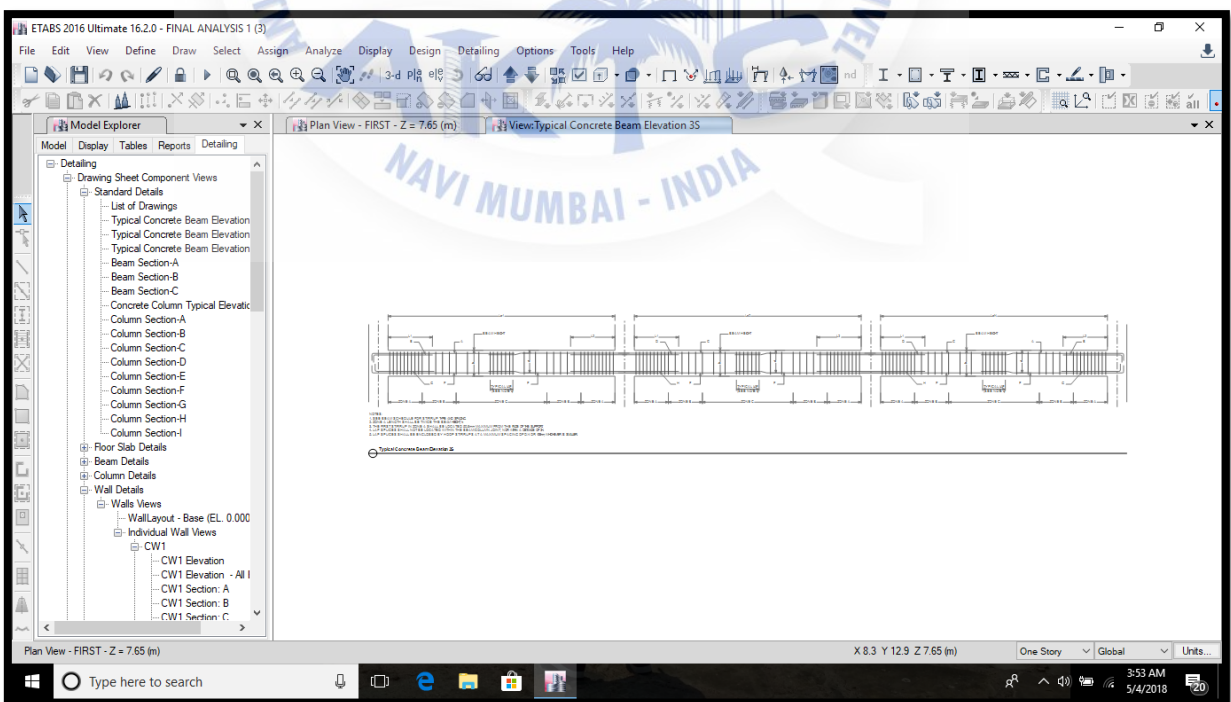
Reinforcement in Typical Beam beneath three adjacent slabs
